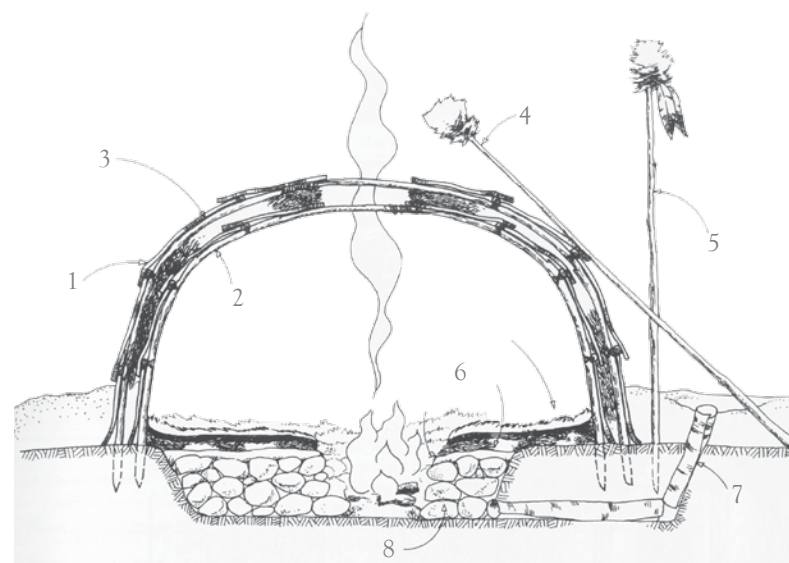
Section through a wigwam 8 to 12 feet in diameter with a frame built of 12 to 15 poles spaced 2 feet apart. (1) Covering is bark or reed mats. (2-3) For winter months an inner frame and cover was added with a 6 inch moss or grass infill. (4) Cedar pole used to swat out sparks on the roof. (5) Clan pole. (6) Floor base is clay beneath moss and cedar or balsam boughs covered with rush mats, furs and rugs. (7) A fire is recessed in the rocks that radiate stored heat.
